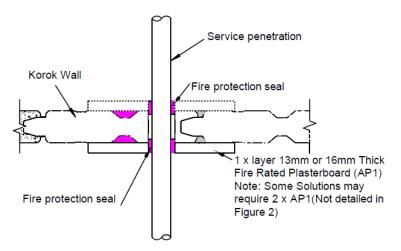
Horizontal cross section for additional protection AP1 in Korok panel systems
